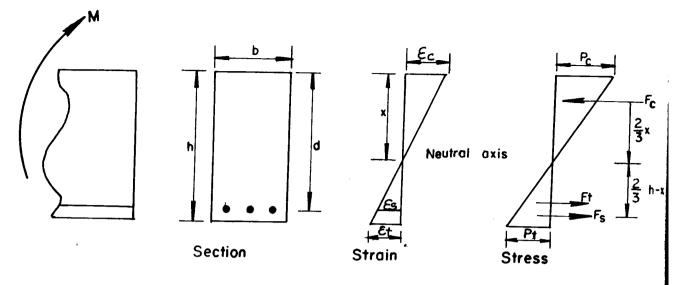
Figure I. Elastic Strain and Stress Blocks of Uncracked Reinforced Concrete Section
